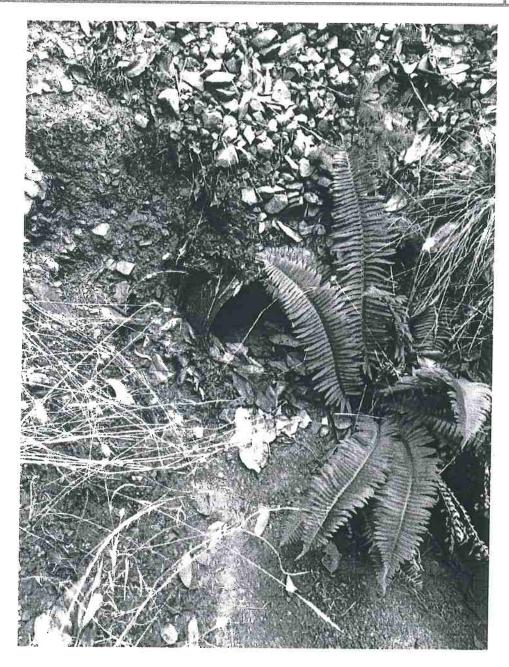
Crossing #1 outlet. Photo date 11-11-16
